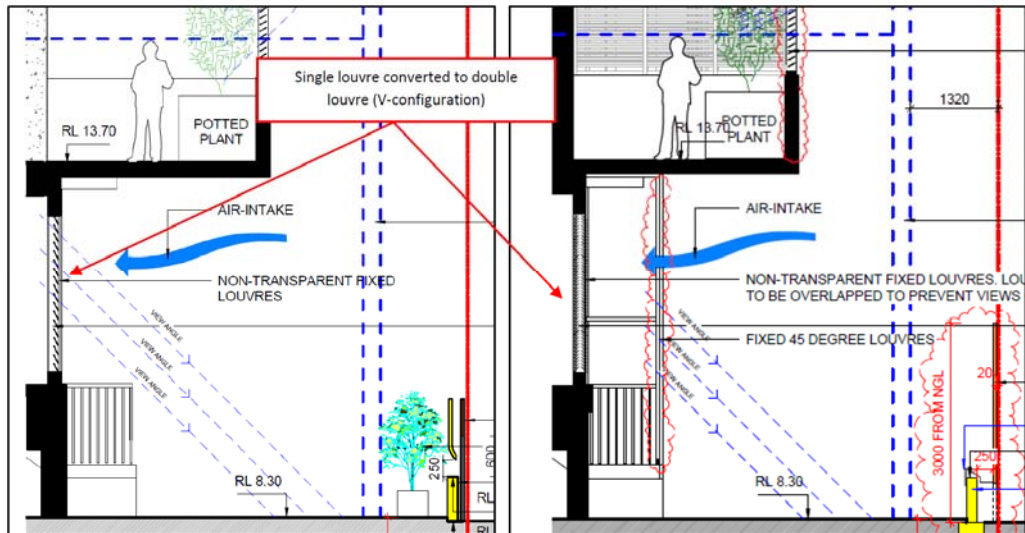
Car Park louvre design (left): original design and (right): proposed final design
